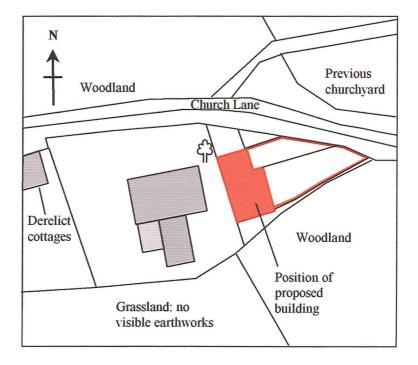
Plan of the proposed development, at scale 1:500. The area of the watching brief is outlined in red. Plans by permission of Mr. J. Bass.
